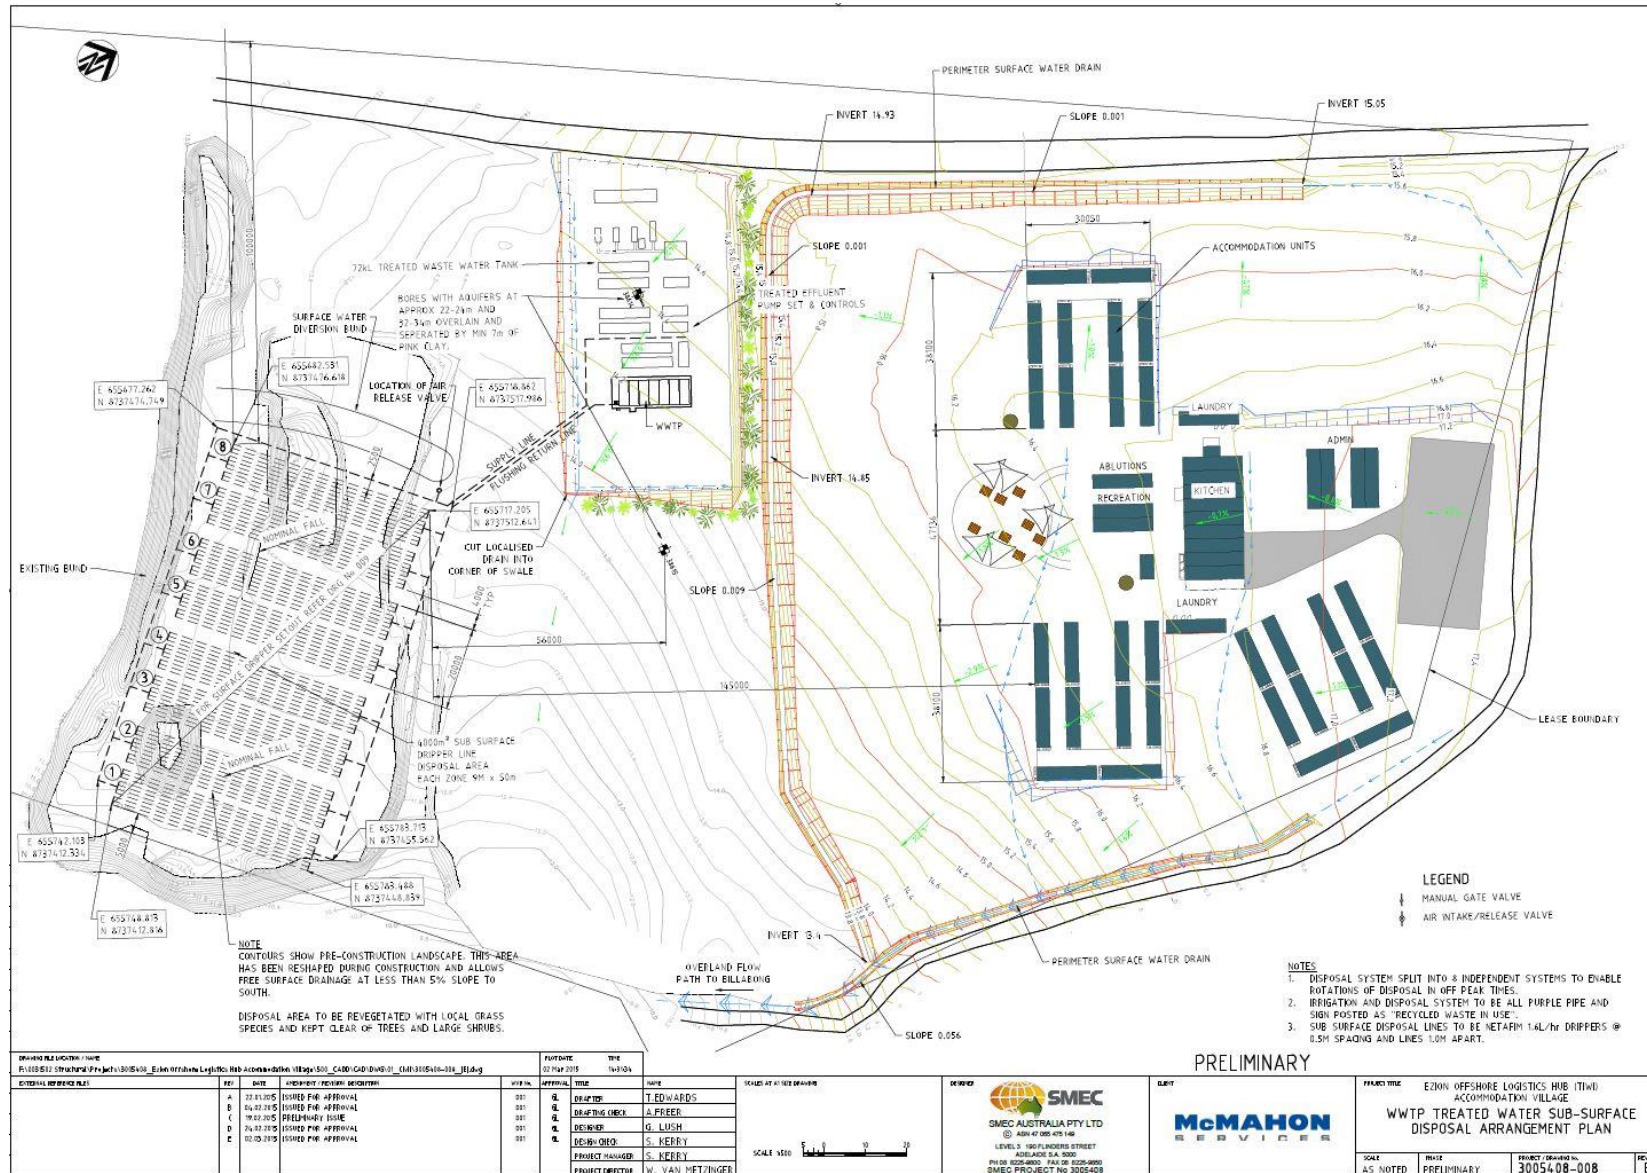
Plan showing layout of accommodation camp and treated wastewater disposal area
